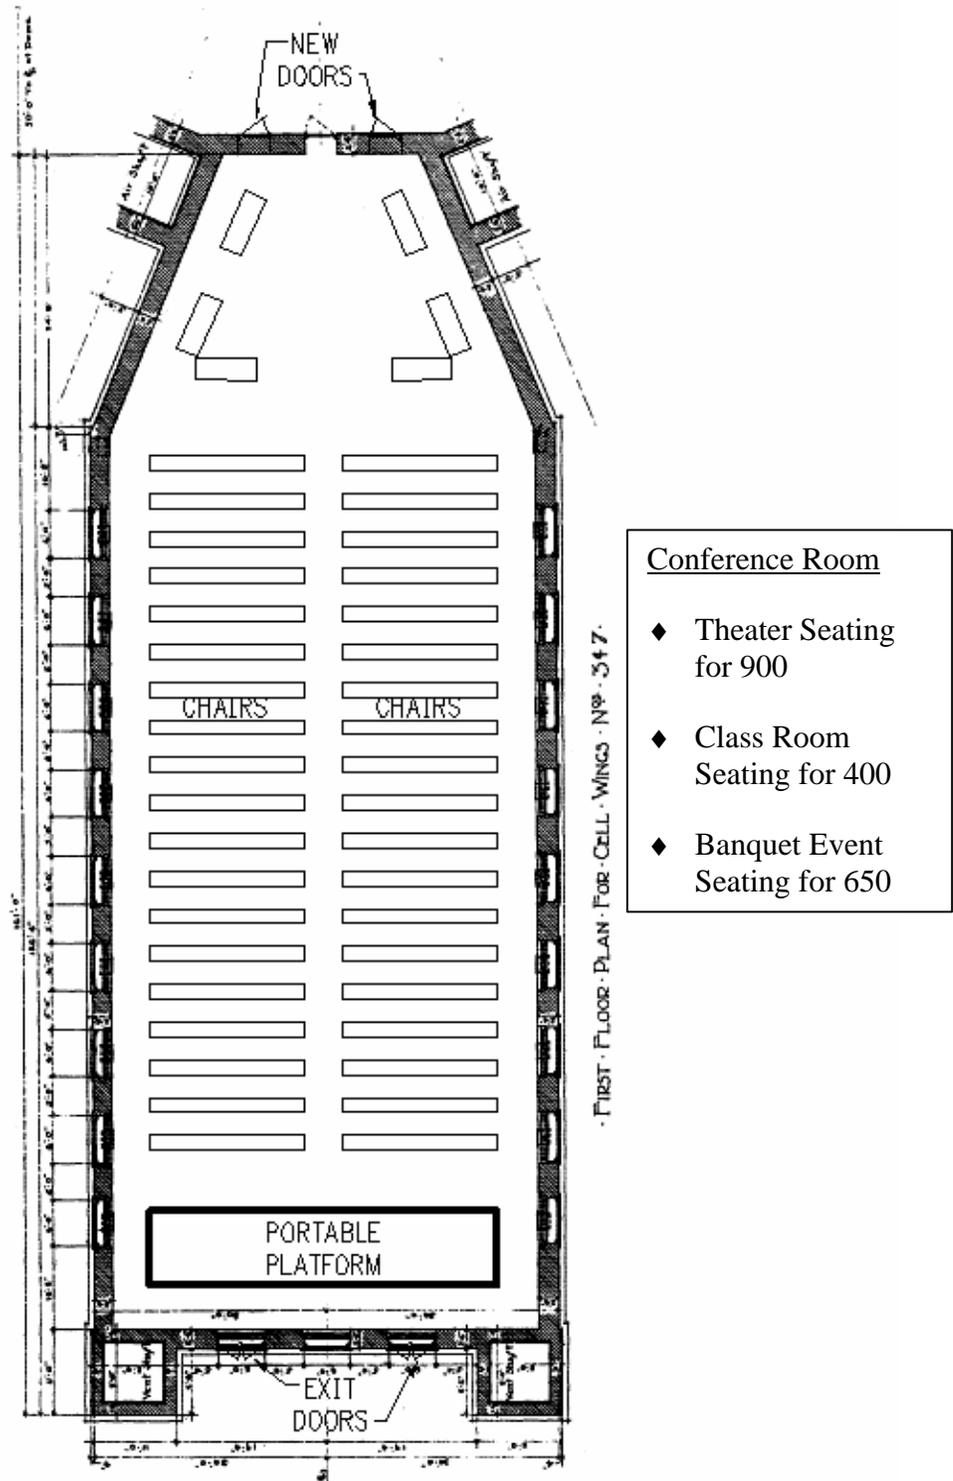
Floor Plan of Typical Prison Cell Wing for Conference Meeting
